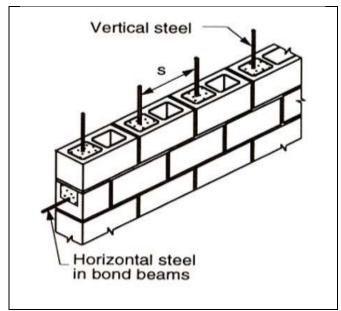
Reinforcement in Partially Grouted Reinforced Masonry Wall
